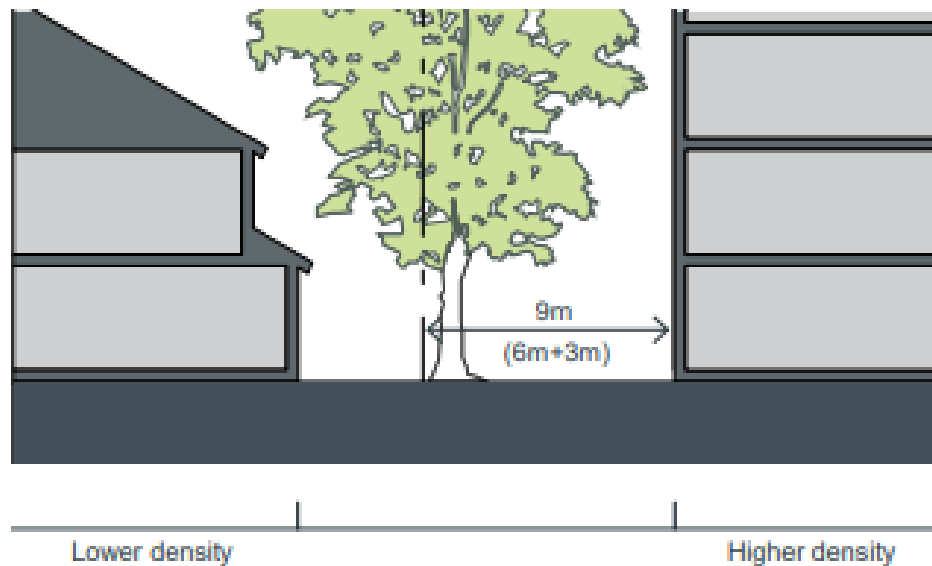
F.5 To resolve amenity impacts, apartment buildings should increase the building separation distance (+3m) when adjacent to a different zone that permits lower density residential development
